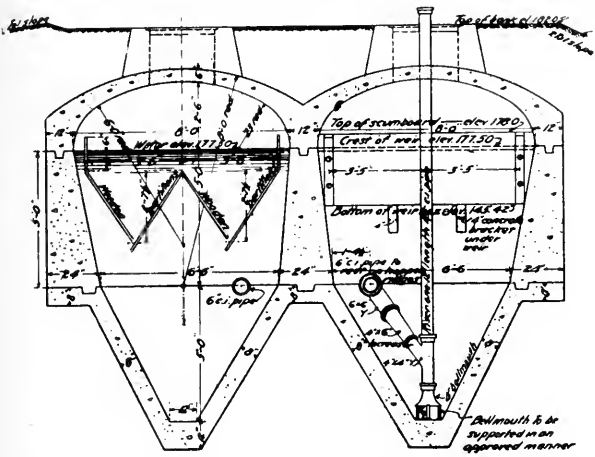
CROSS SECTION OF PRELIMINARY SETTLING TANK.
